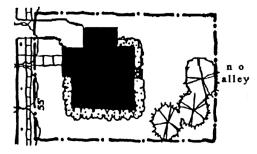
A.4.a Garage Setbacks/No Alley
